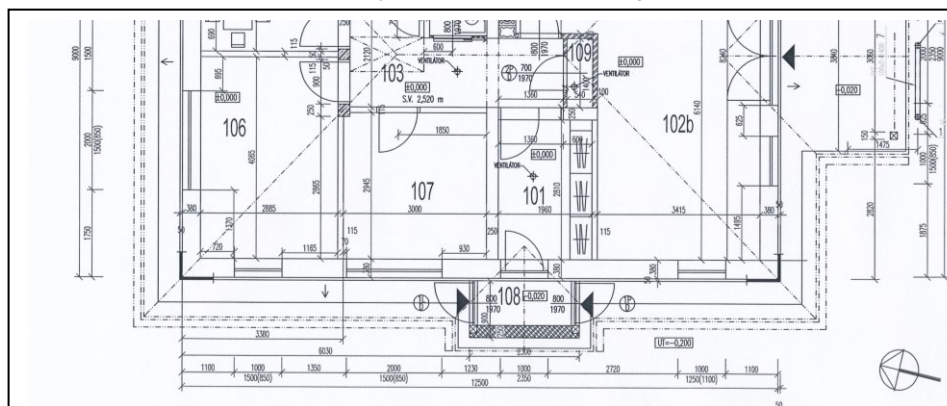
Ground floor plan of the play room 107 and vestibule 108
